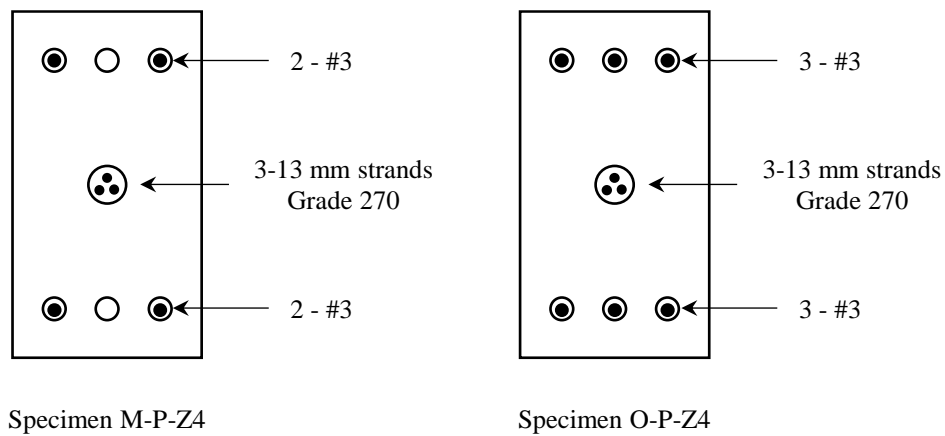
Typical beam sections of the tested hybrid specimens for Phase IV.
